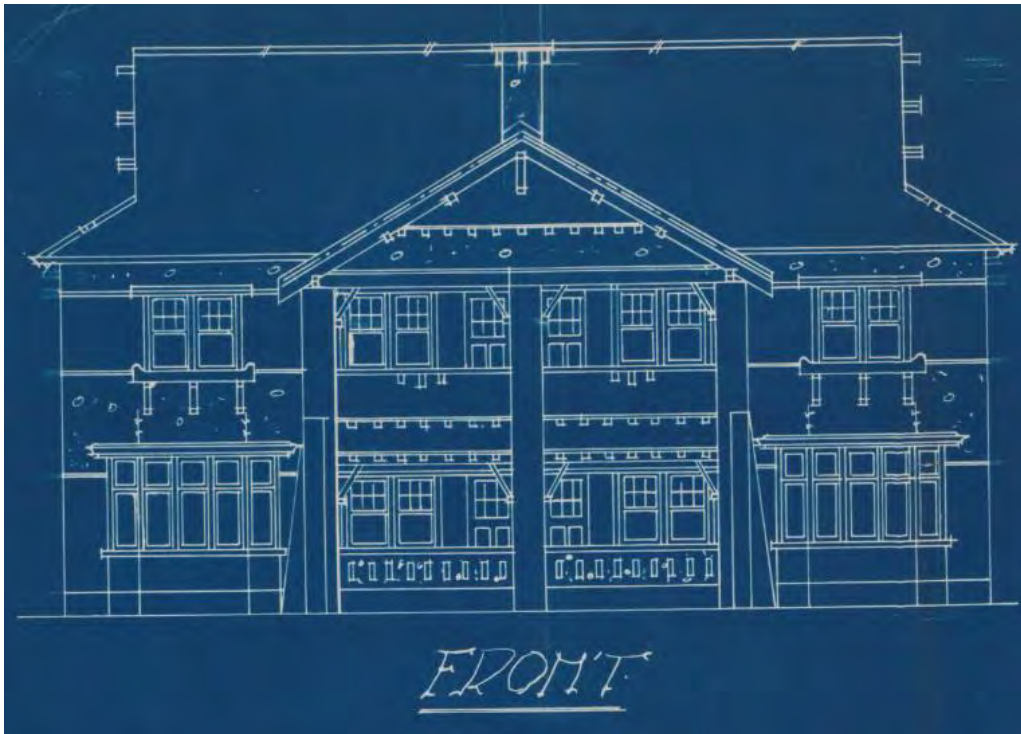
'Brick flats at St Kilda for Miss Marr. Dunlop and Hunt. Home Builders Ltd. 317 Collins St City'. Source: City of Port Phillip.
